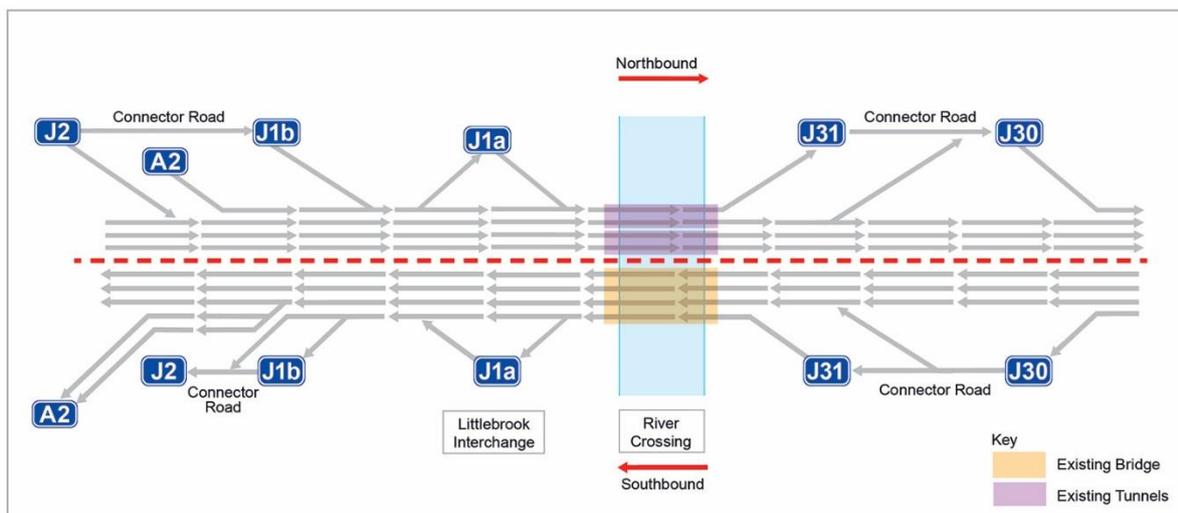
EXISTING ROAD LAYOUT ALONG M25/ A282 CORRIDOR
